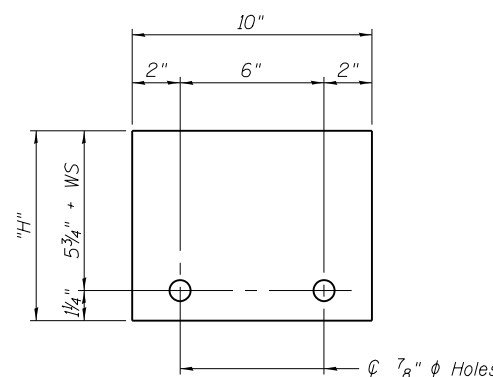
Detail II - Installation for a new deck beam with an initial concrete wearing surface. Additional bar splicers shall be provided at 6'-0" centers and paired with the bar splicers of the concrete wearing surface reinforcement to accommodate the installation of the retainer assemblies. The cost of the additional bar splicers is included with the concrete wearing surface.
